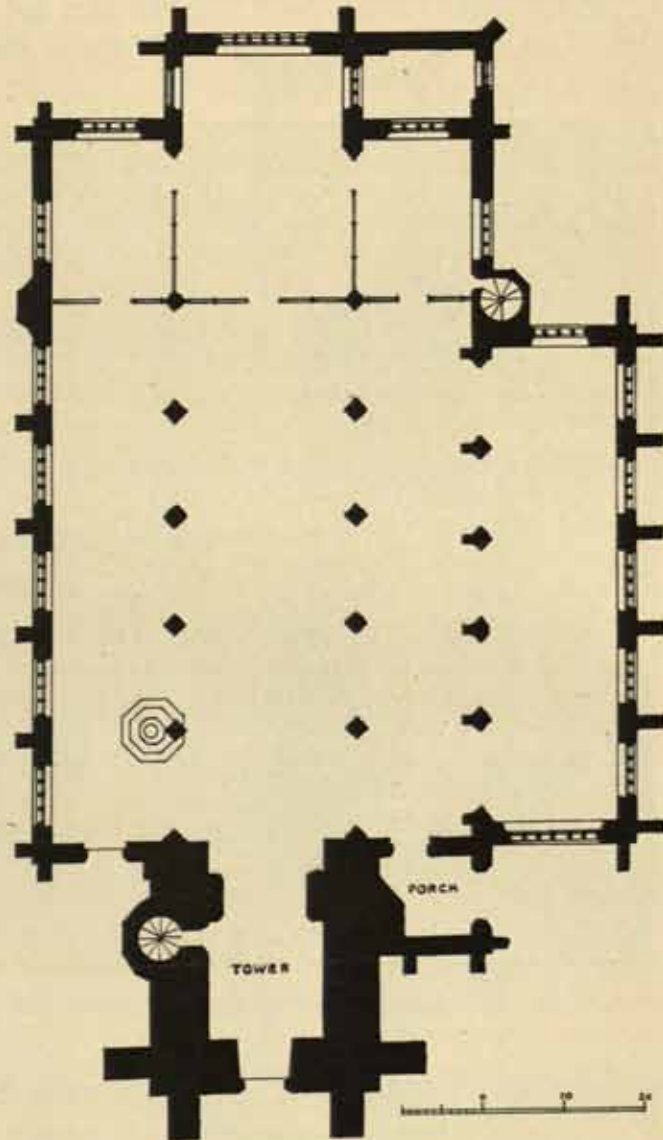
CULLOMPTON CHURCH: PLAN.
